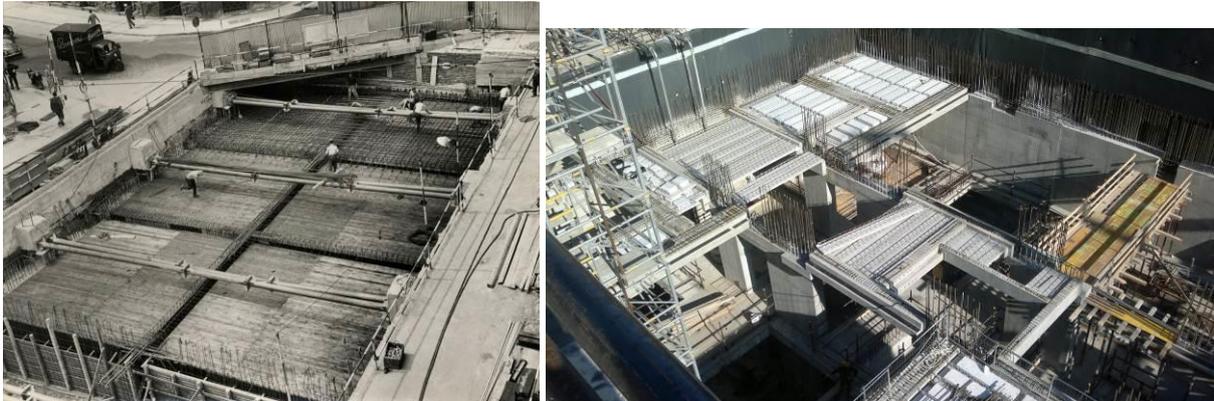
Construction of an underground station roof (Palestro-M1 '60's – Lotto- M5 2013)
